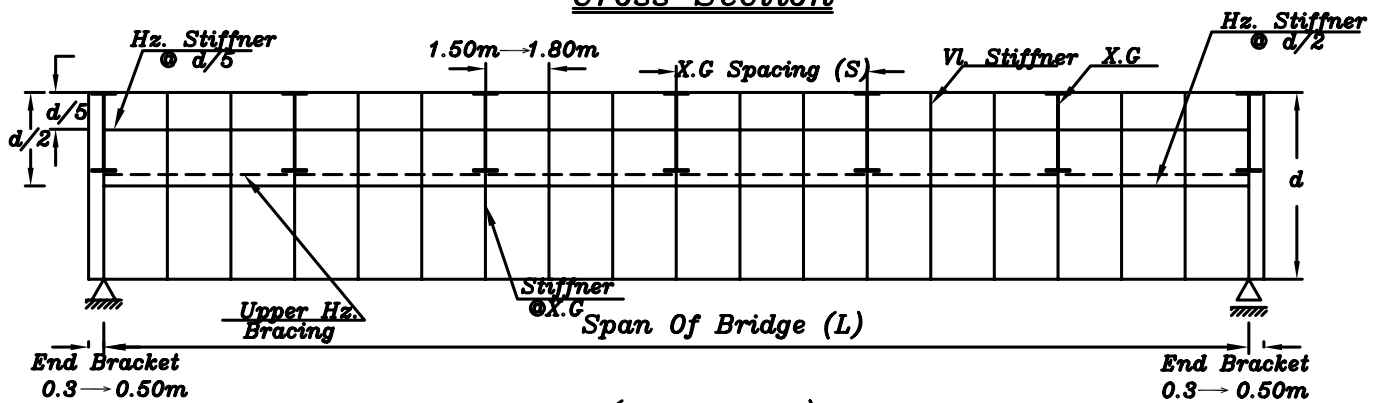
# PLATE GIRDER DECK BRIDGE RAIL WAY WITH VERTICAL BRACING (SINGLE TRACK)
